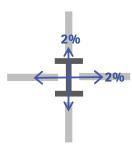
Diagram of column lateral bracing requirement in NYC Building Code
